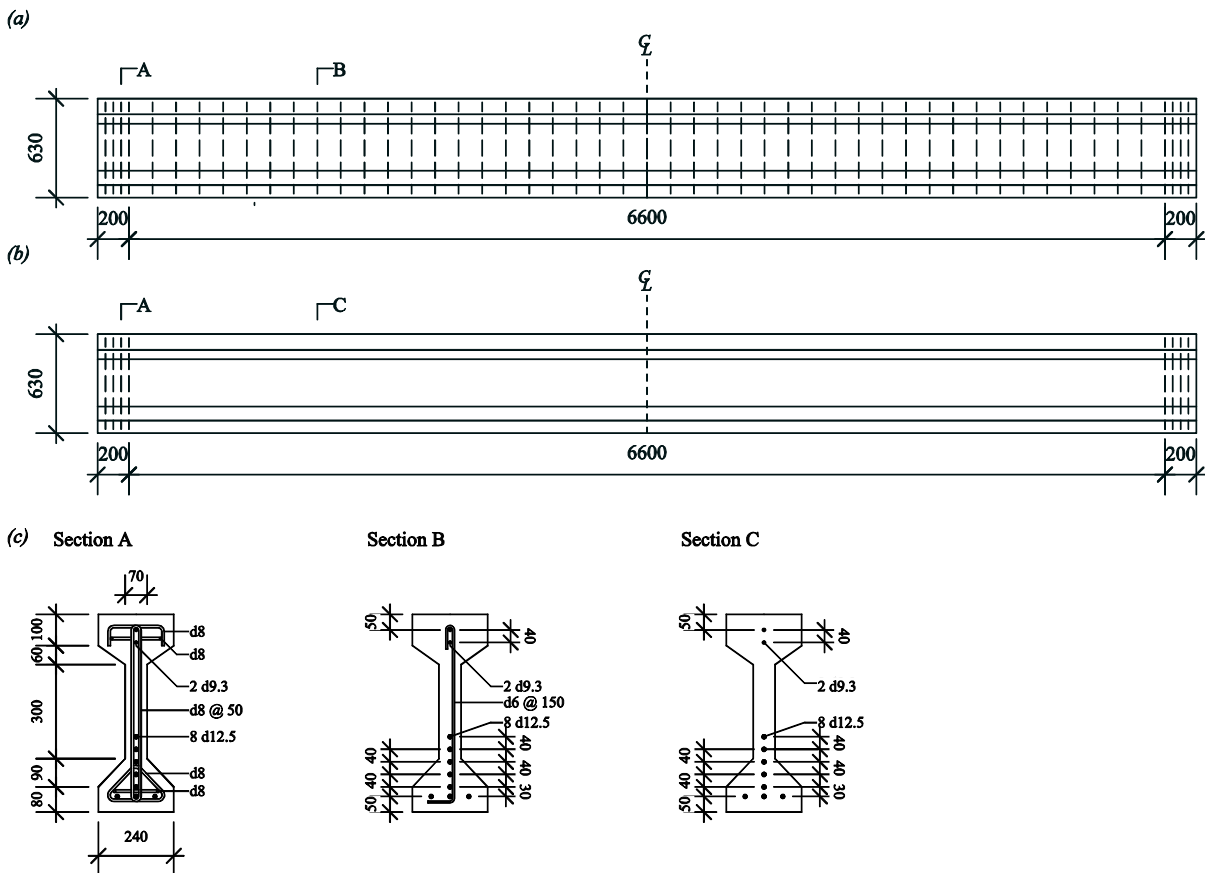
(a) geometry, prestress and reinforcing layout of specimens B101, B102, B104 and B105; (b) geometry, prestress and reinforcing layout of specimens B103 and B106; (c) cross sections of specimens and reinforcement details; note: units in millimeter (25.4mm = 1 in.)
